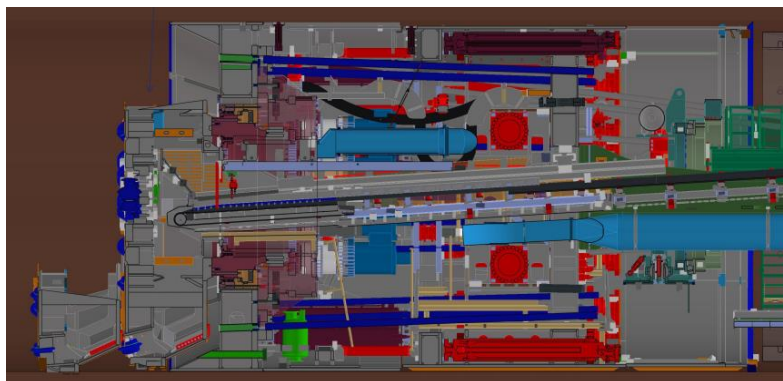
Cutting and rotation of the cutterhead ("HK 5102-091-001-01 Shield Disassembly", Herrenknecht, 2022)
